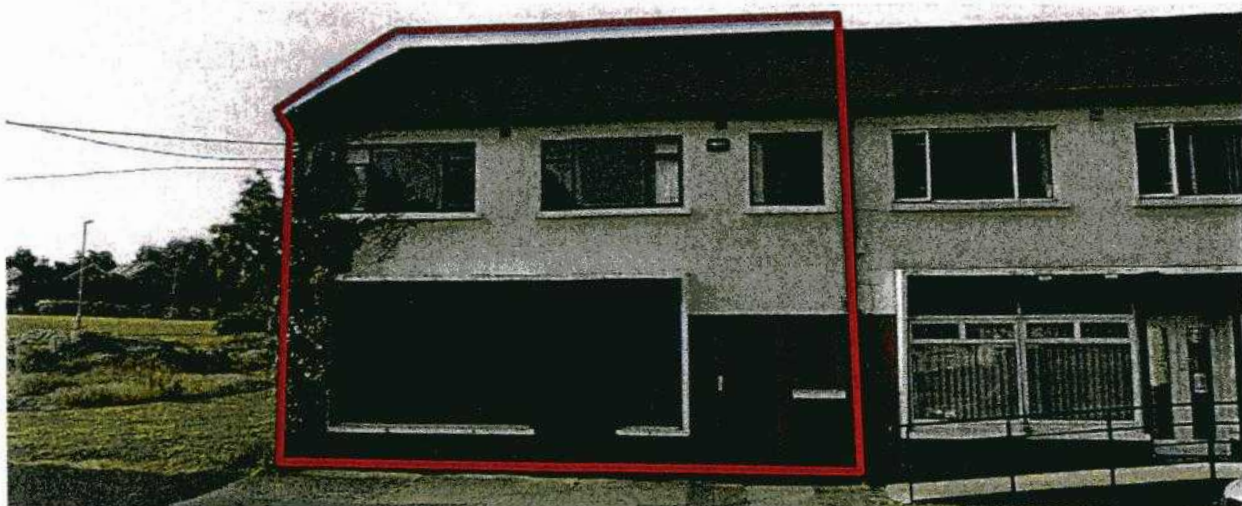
Street view image of front elevation of subject site (outlined in red).
